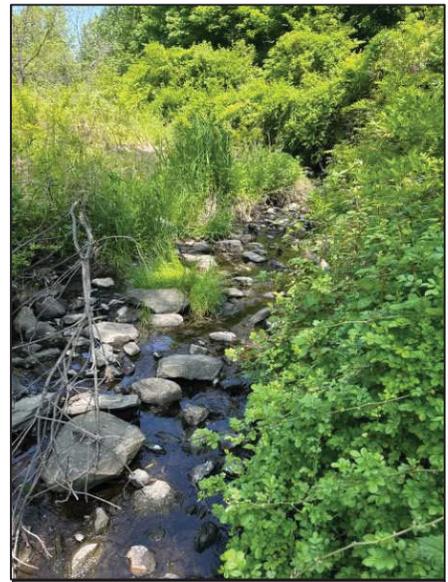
Existing Conditions of Proposed Bridge Crossing Area
